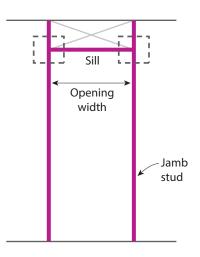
Alternative Sill S1 Connection 'A-2' Elevation
